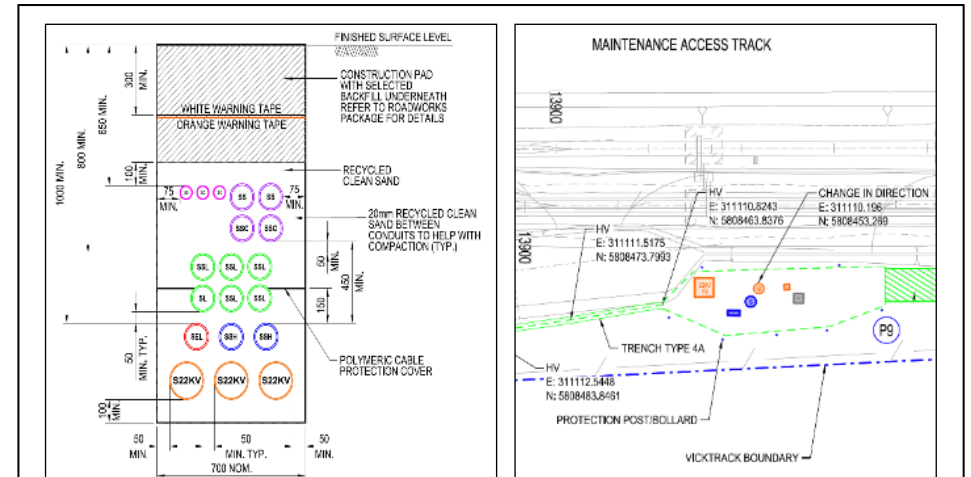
& 3b: Design documents for a trench cross-section and pit cluster of a fully compliant CSR. This one has 19 conduits, and only 5 hold cables on the day of commissioning.
